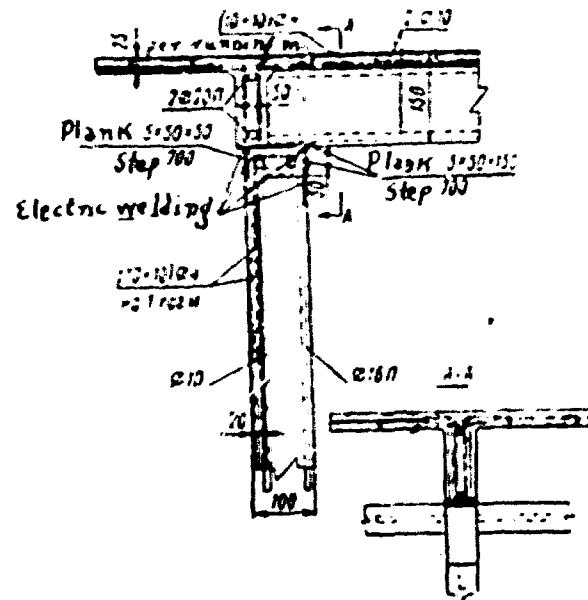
Connecting the Longitudinal and Transverse Bulkheads on the Fitting Outlets.
